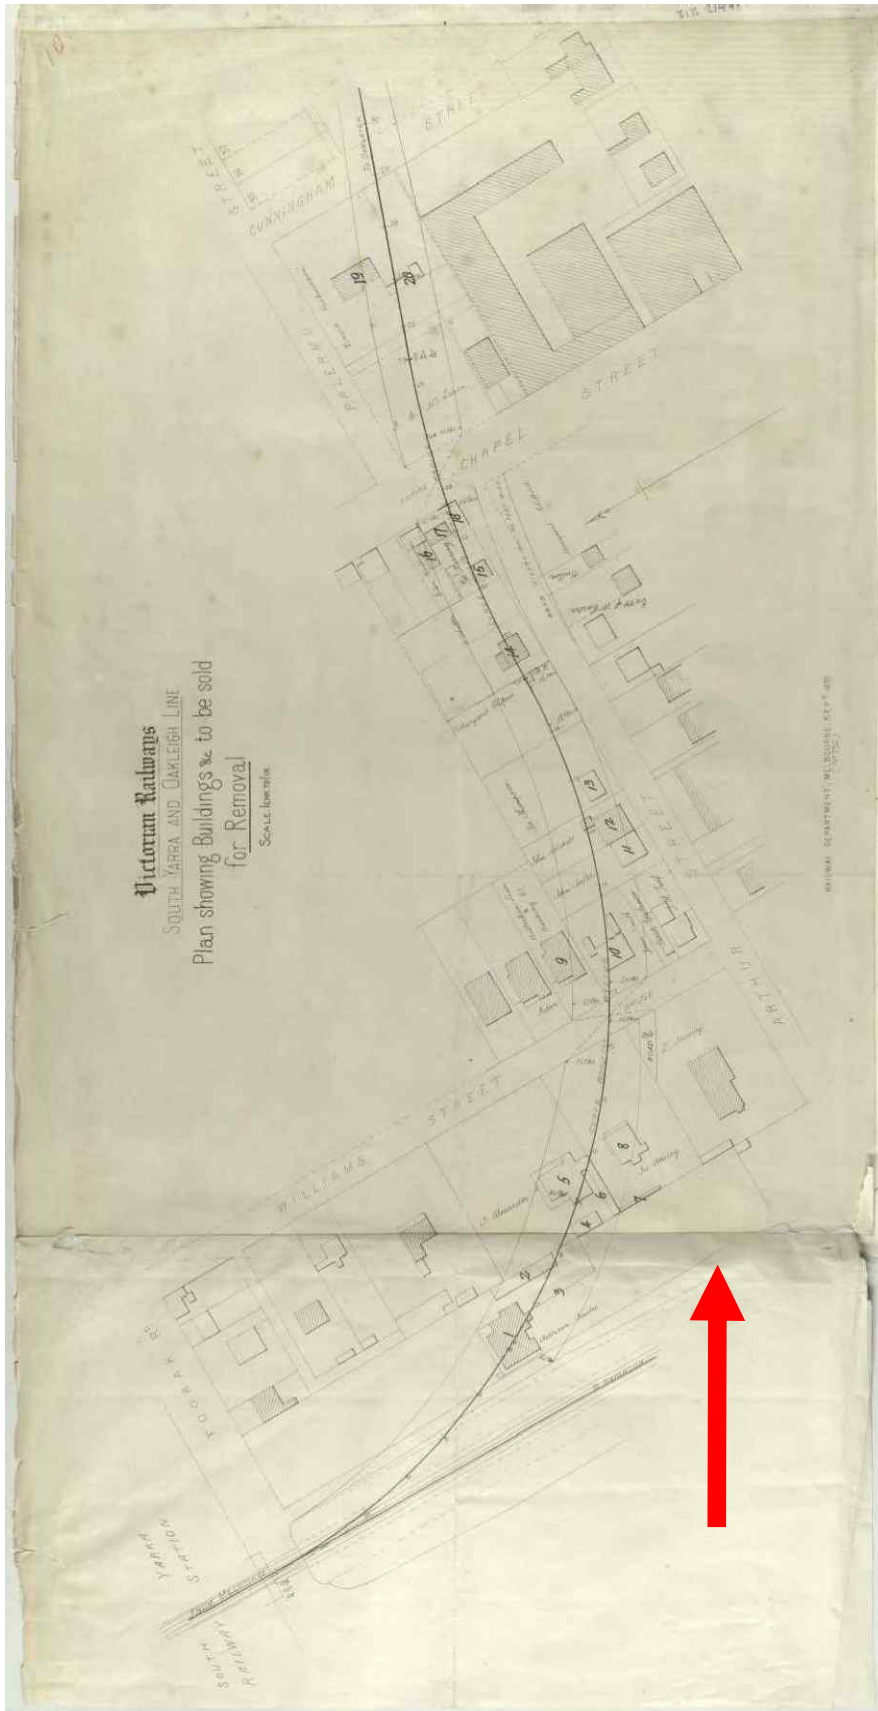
Victorian Railways plan of 1878 showing buildings to be removed at South Yarra as part of development of Oakleigh railway, reserve indicated by arrow; north is to the bottom left of the image
